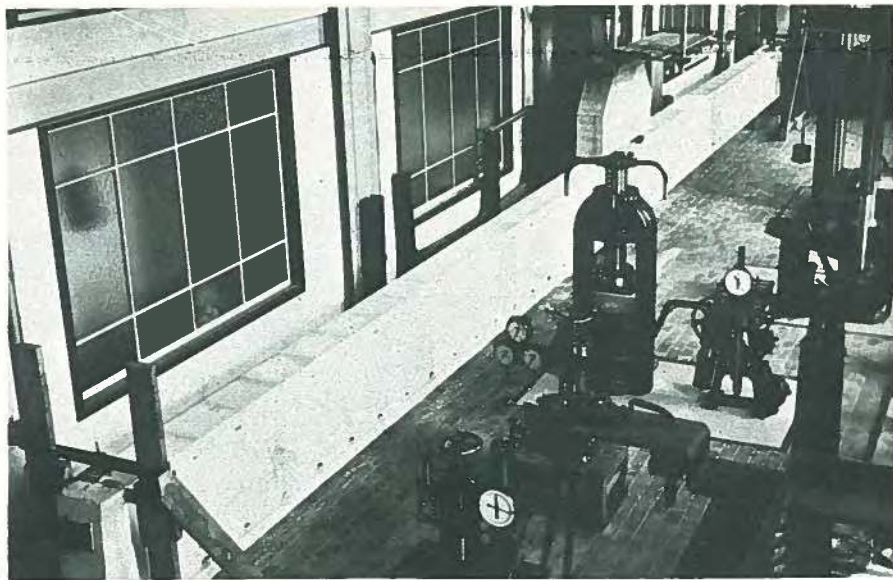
Magnel's Reinforced Concrete Laboratory tested only full-scale concrete members. Magnel had little use for small-scale models. Shown here is the testing of a 66 ft (20 m) block beam.
